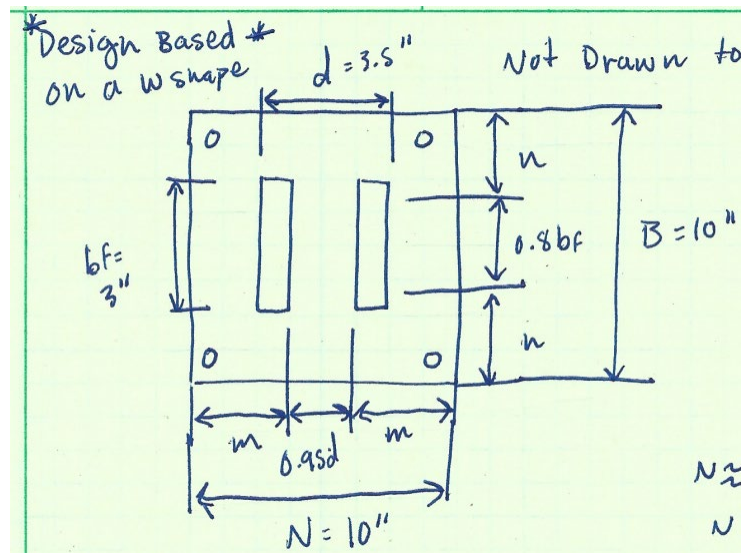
Baseplate design with the Anvil welded beam attachment.
